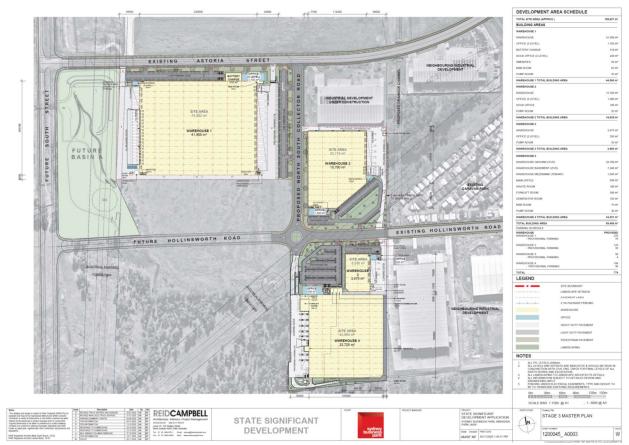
Stage 3 Master Plan, as revised (Source: Reid Campbell)
